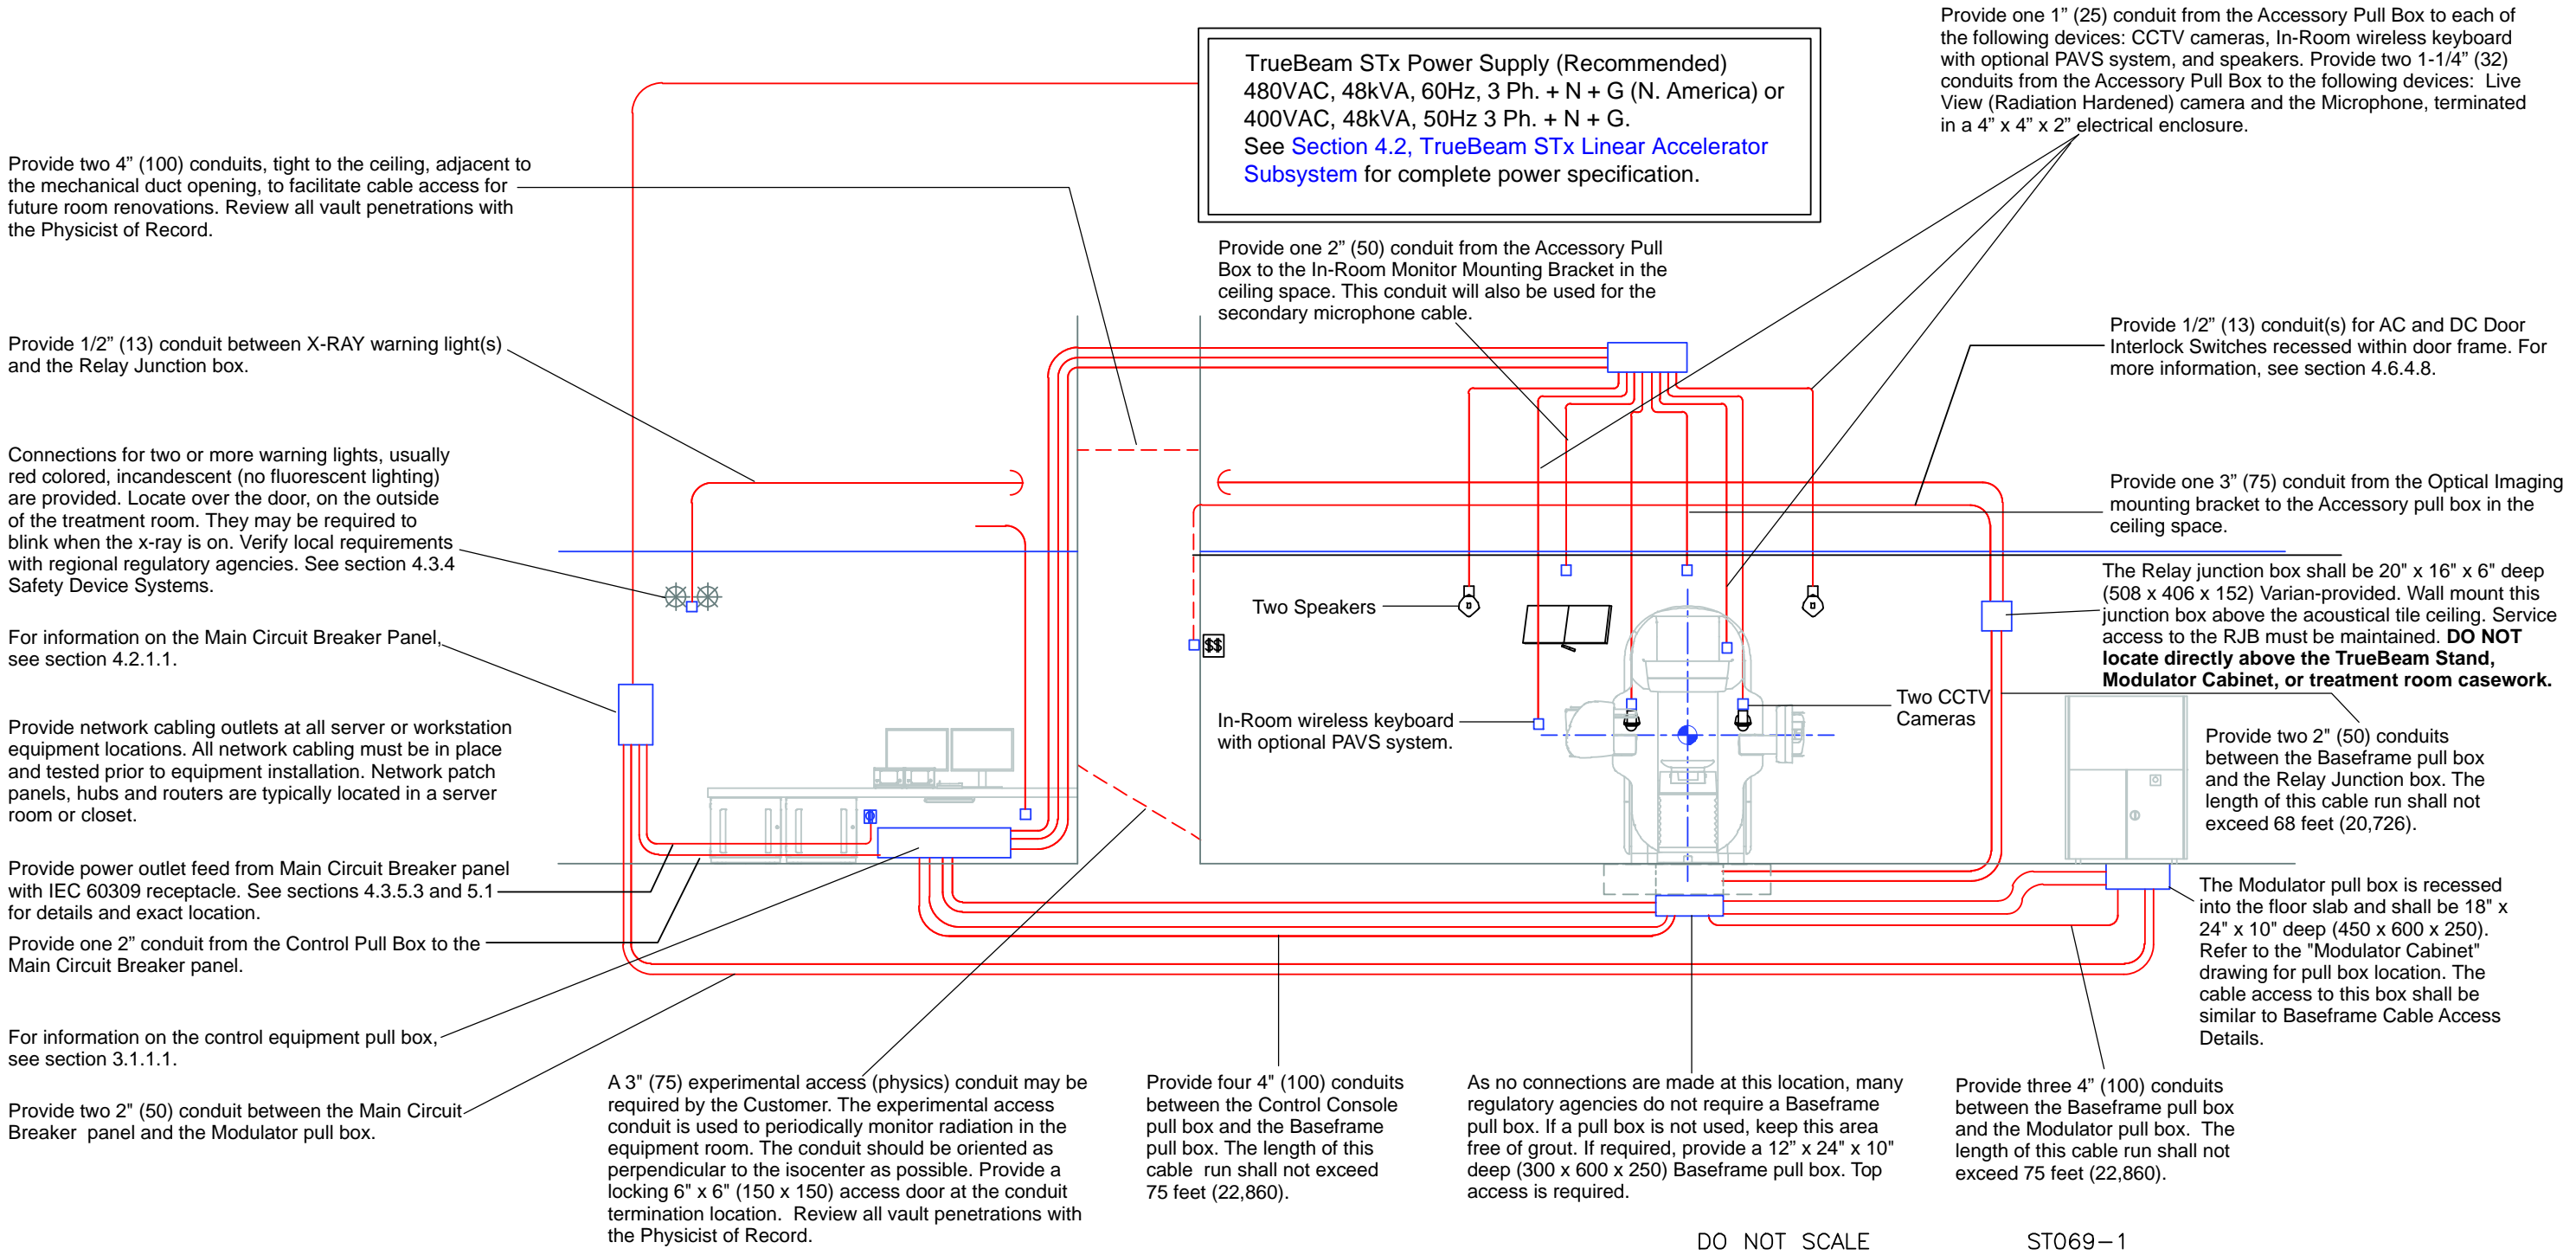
Typical TrueBeam STx Conduit Diagram (Section View) without ExacTrac
